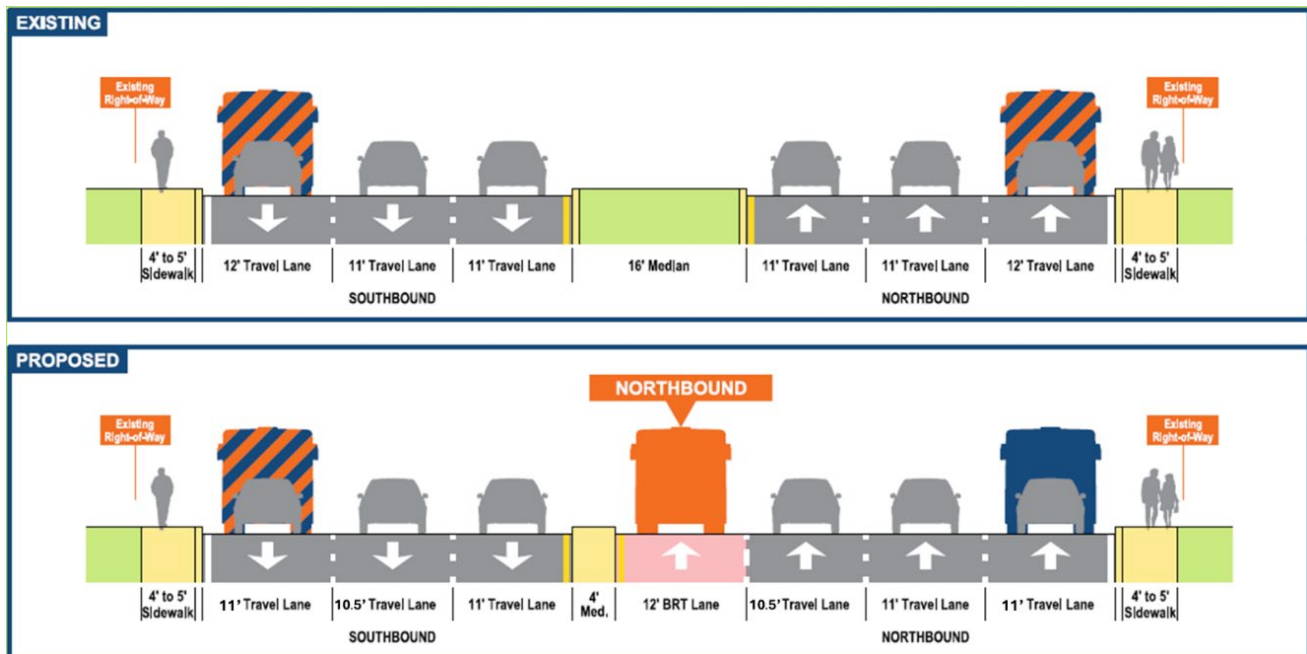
Existing and Proposed Cross-Section from Franklin Avenue to I-495
